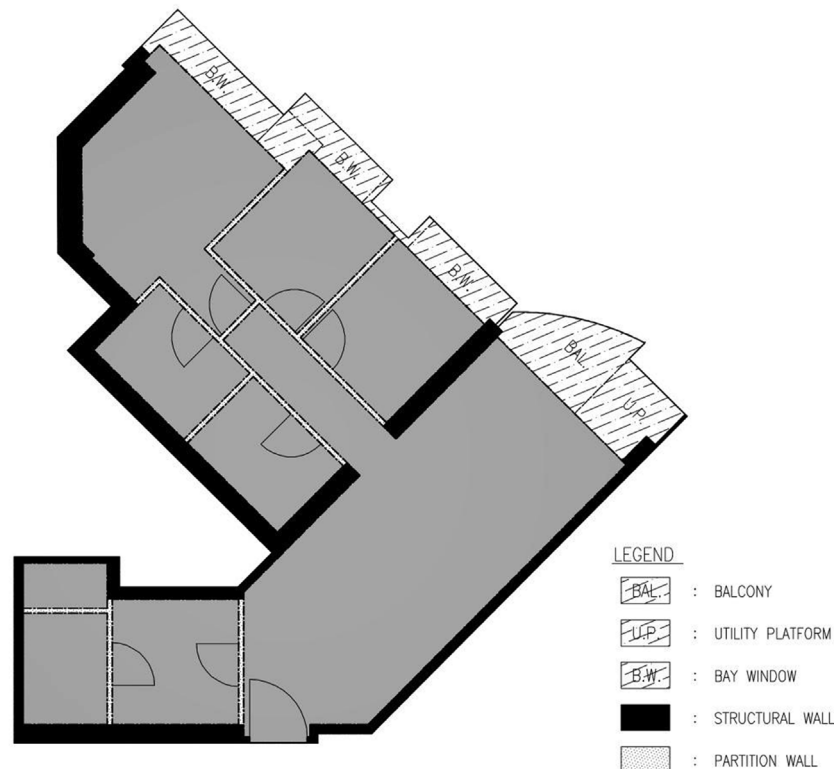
Floor Plan of Unit B (comparatively high shrinkage ratio).
